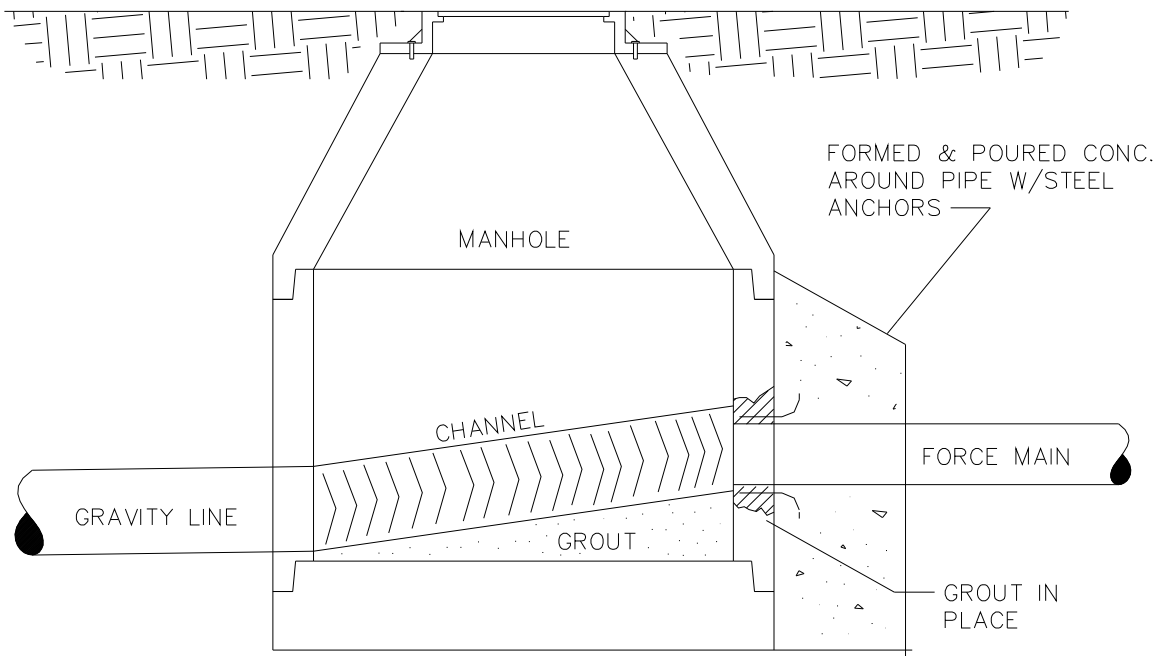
DETAIL SHOWING CONCRETE ENCASEMENT & ANCHOR BLOCK
